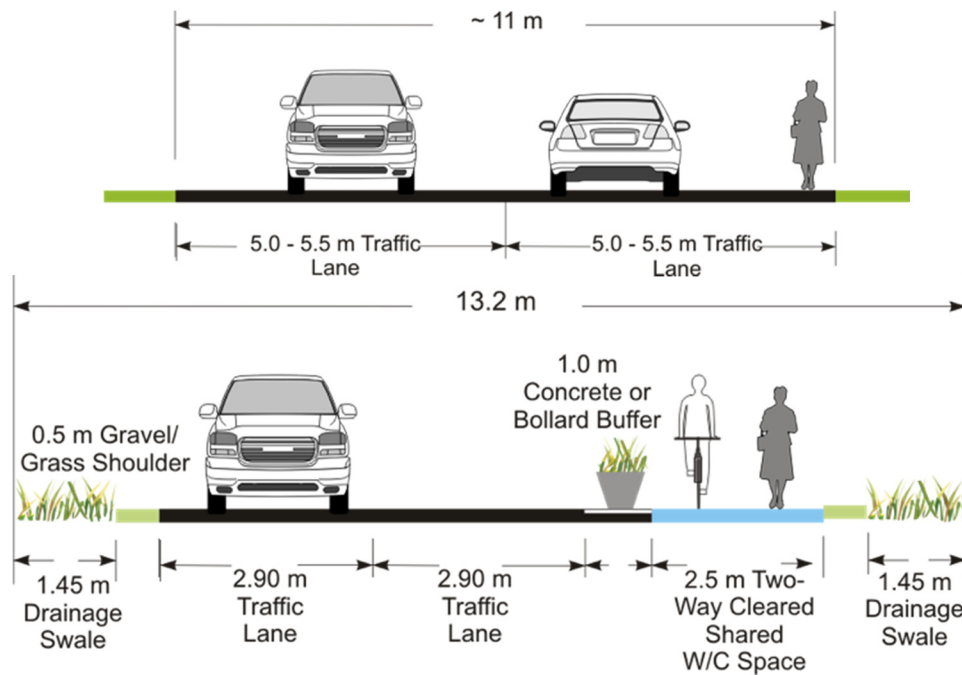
Existing (top) and proposed (bottom) cross-sections for Robson Street
